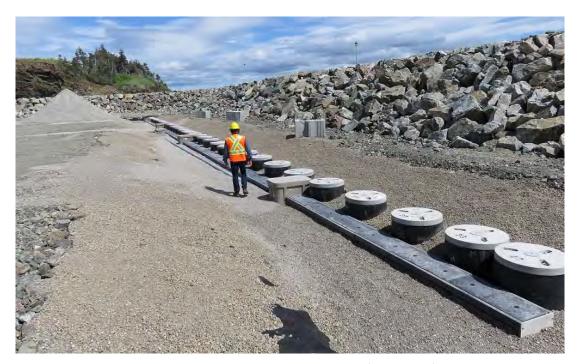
Indian Head Grounding Site – View inside of rock berm (electro yard) showing row of 40 grounding wells awaiting installation of grounding electrodes, with adjacent cable duct.
